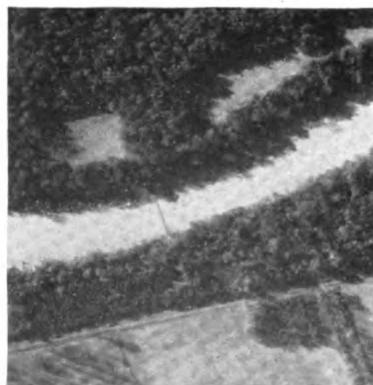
Scale 1:10,000: Footbridge. A single bay consists of two floats and a duckboard, as shown at the left. This bridge can be built from one side of a stream by connecting assembled bays and pushing them out from the bank. One 1½-ton truck can transport 108 feet of this bridge.
